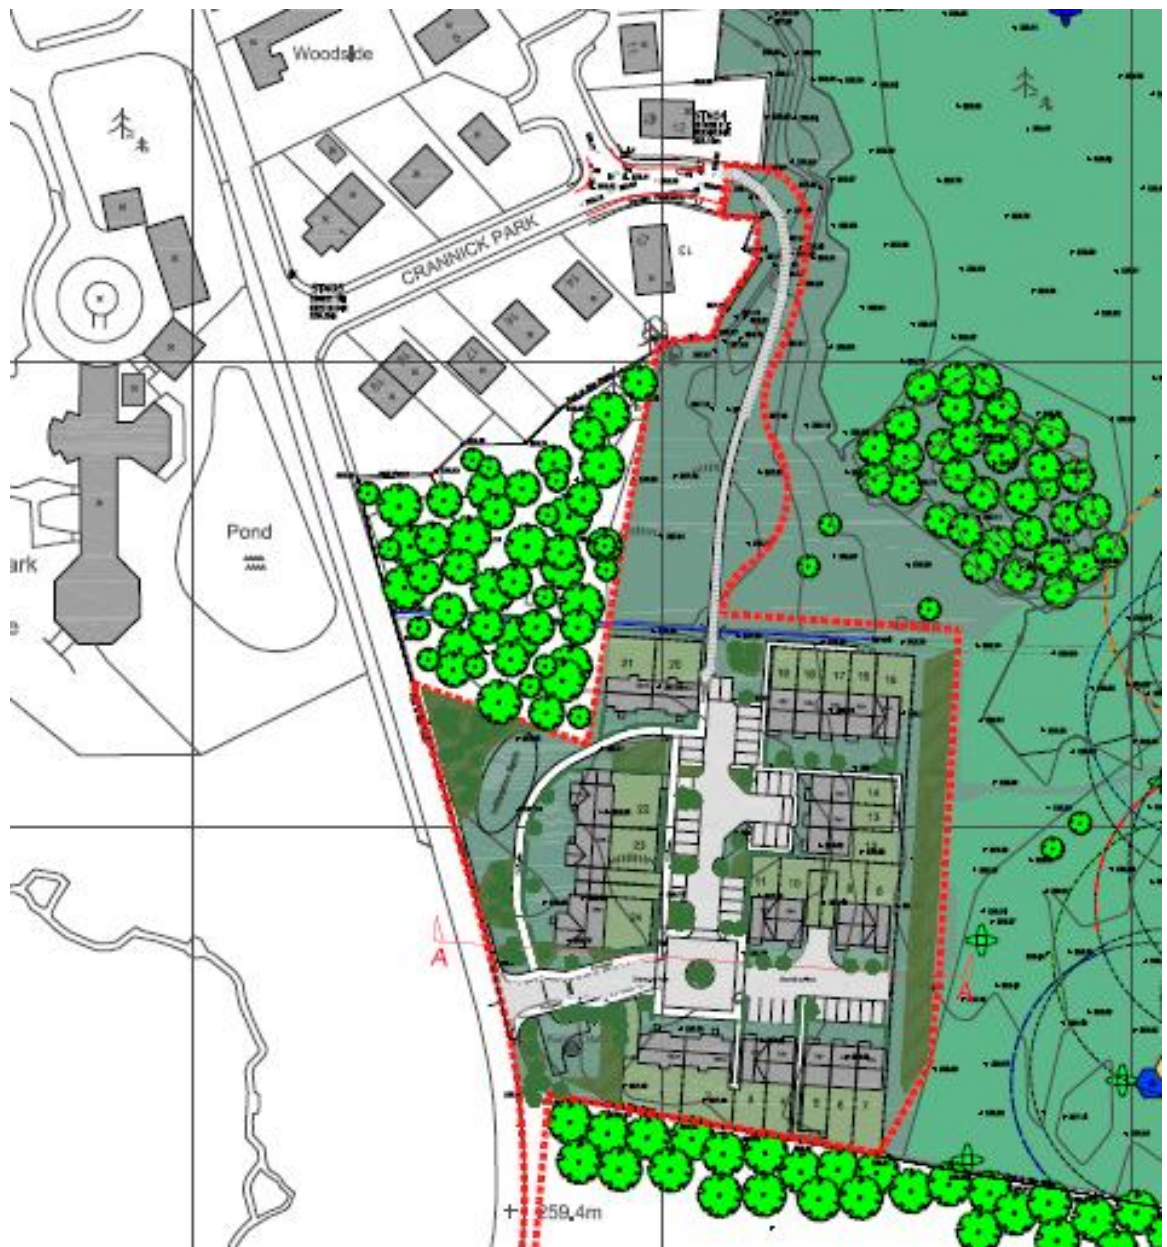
Proposed Site Layout Carr Road Private Housing
